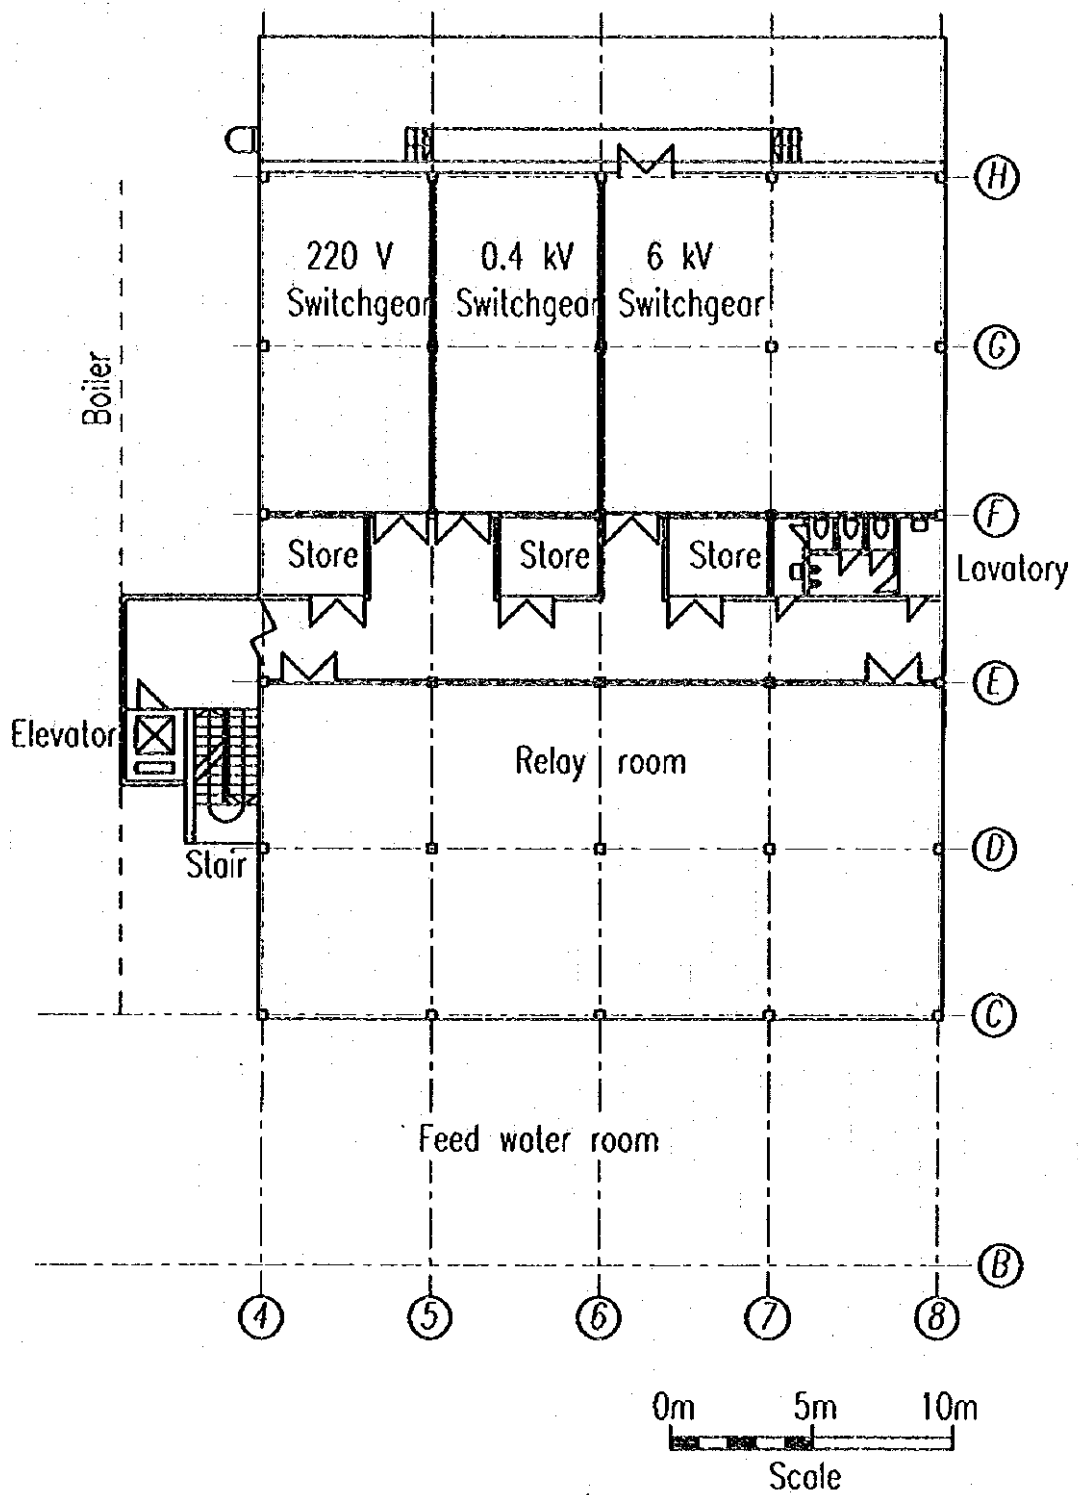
Foot Plan of the Floor at Elevation +6.40
